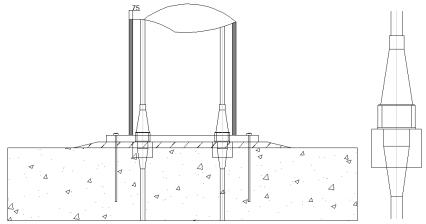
Prestressing in foundation (L) & couplers detail (R)
